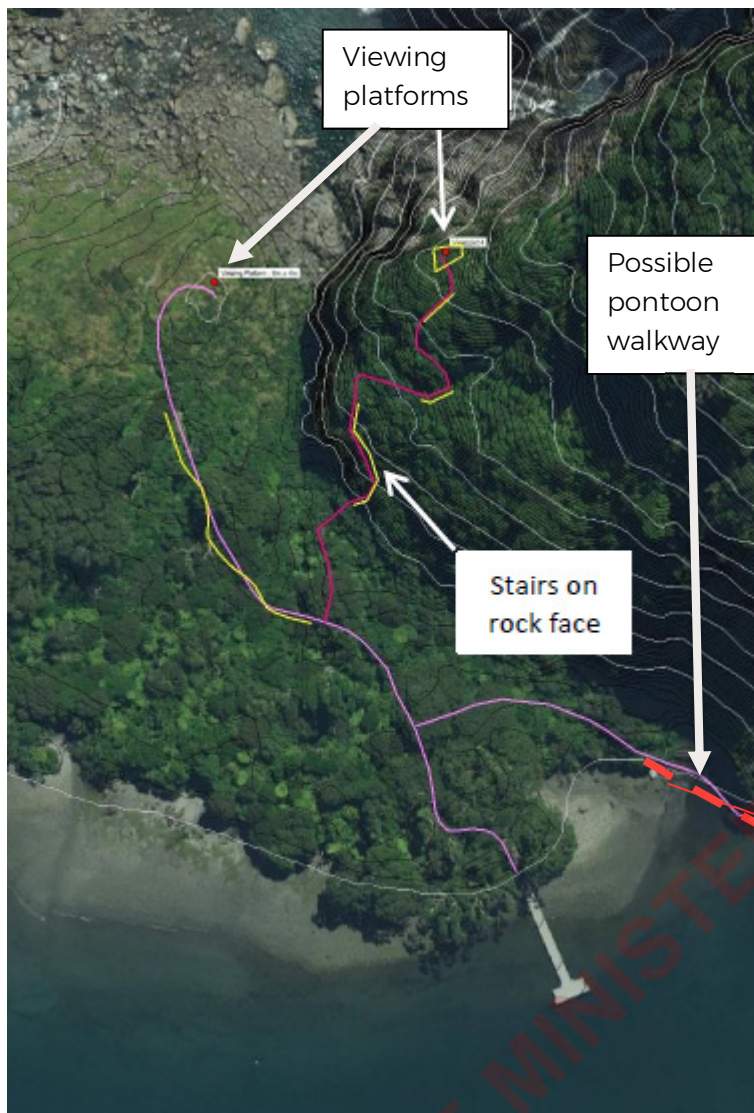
Lower Hine-te-awa Bowen Falls walkway, stairs and viewing platform.
